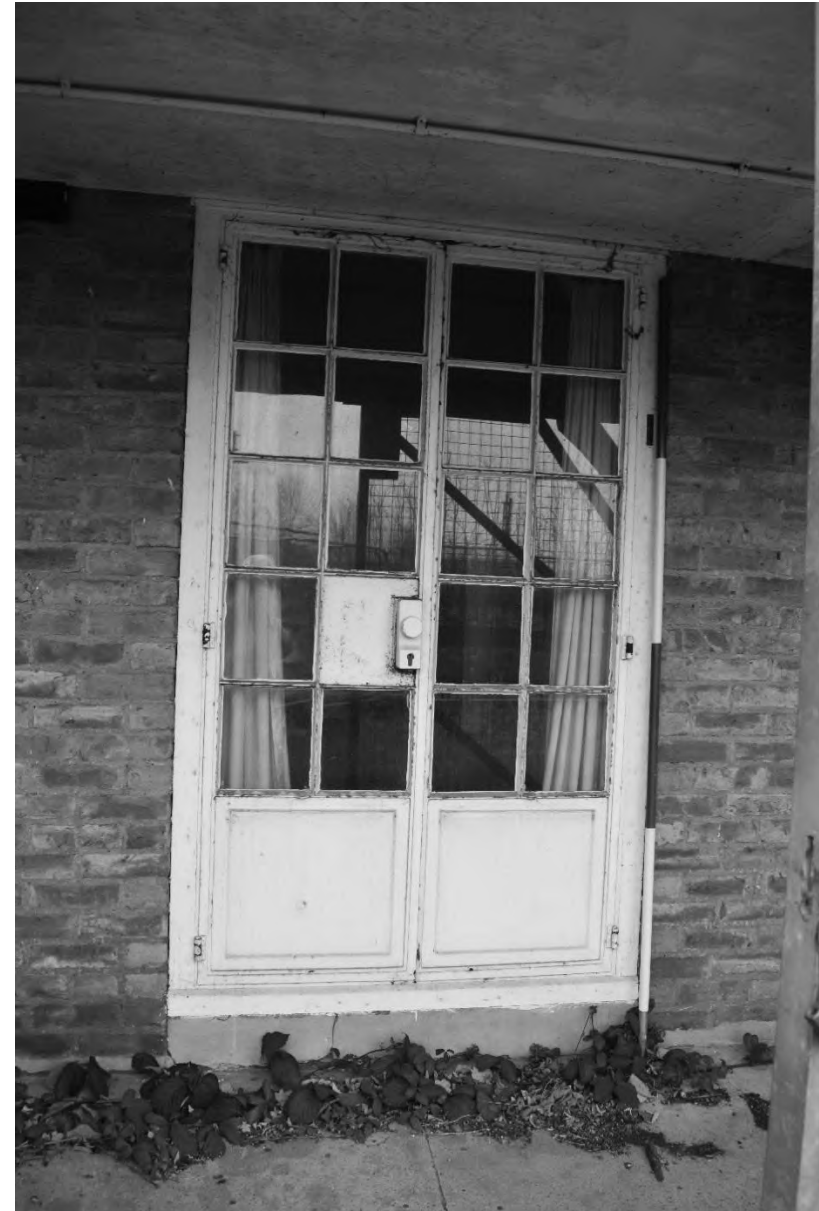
Pavilion: Exterior – South Elevation Door (DSC_0058). Facing North.
